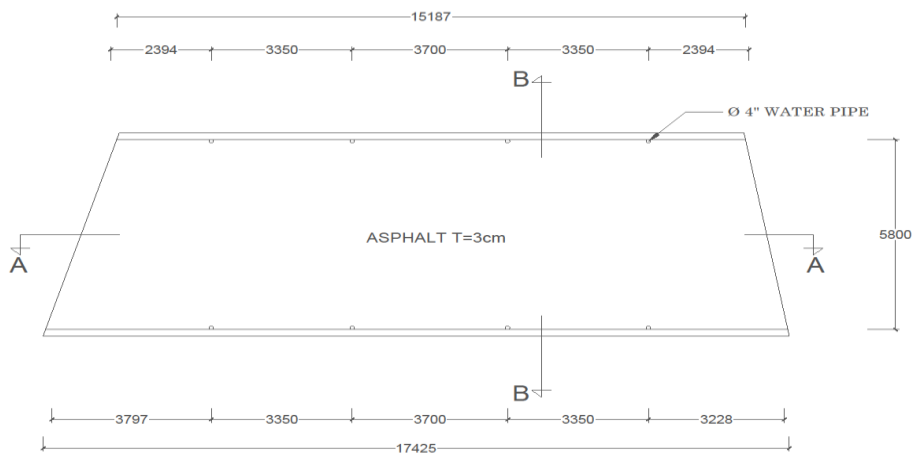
Plan of the Kanaan Bridge (Source: CV Elza Jaya Prima)
